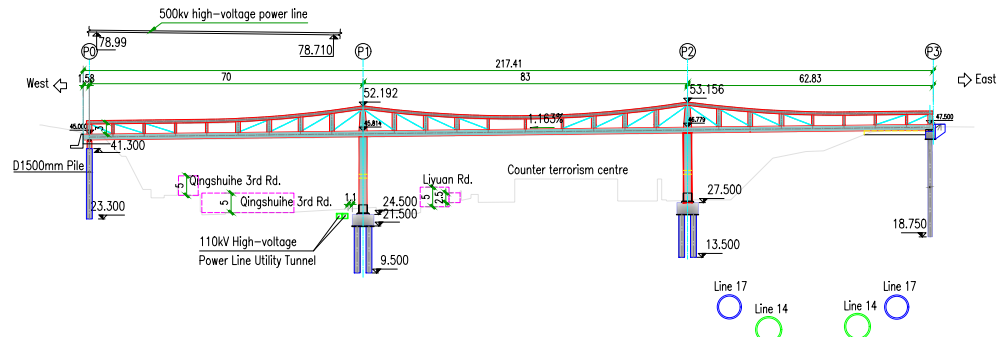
Elevation layout of Kungpeng Trail Bridge No. 3 (unit: m)
